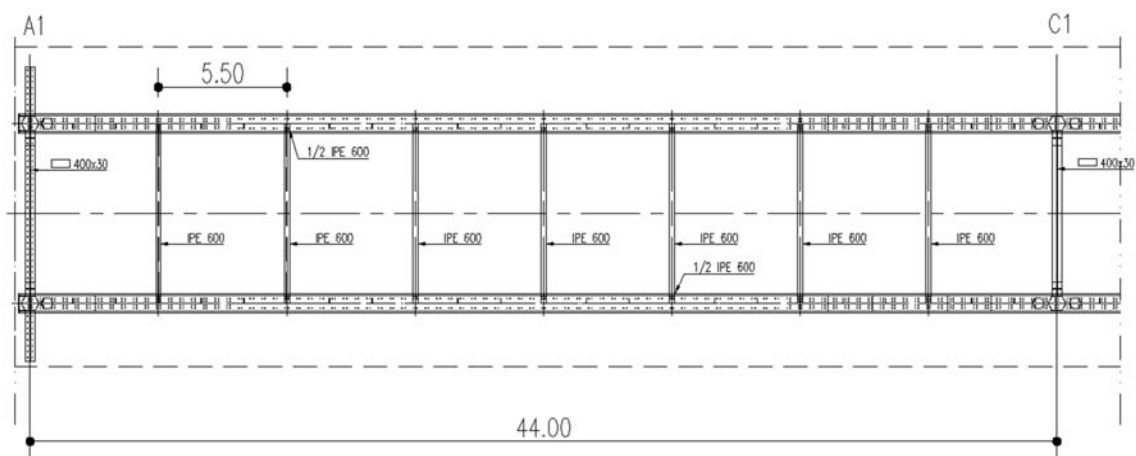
Metallic girders, horizontal plan (m) [105].
